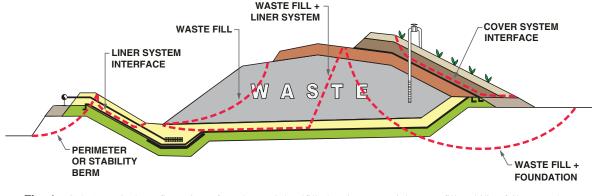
(Color) Typical configuration of modern US landfill showing potential waste fill stability failure modes.
